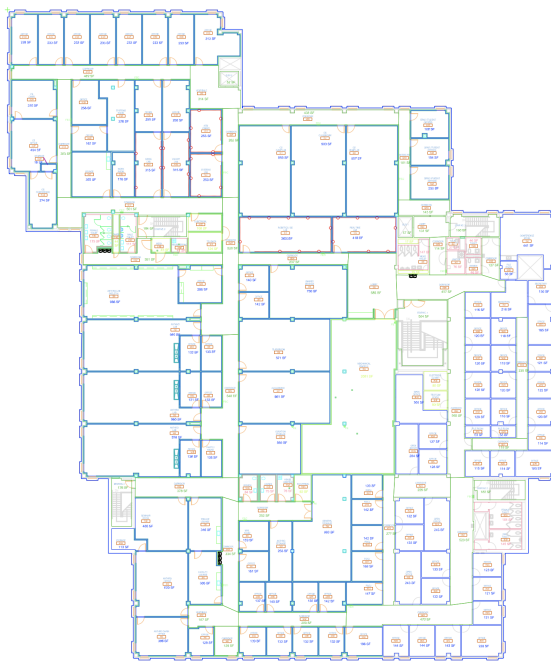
Floor plan of Anne Belk Hall as of 1/13/15, after its renovation
